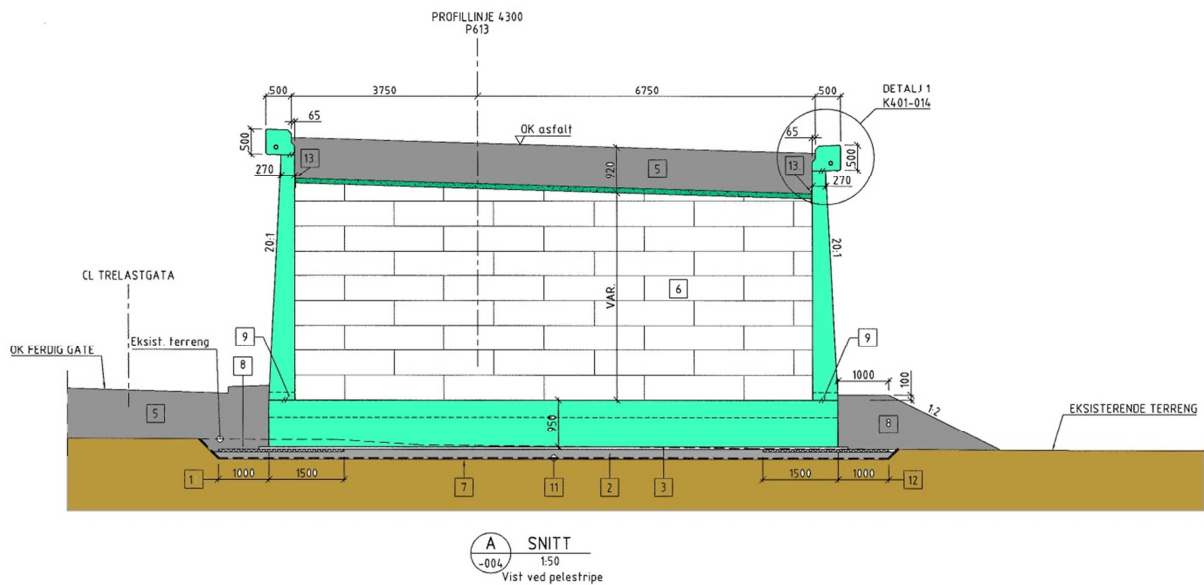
Cross section of bridge abutments for Nordenga bridge (piles not shown)
